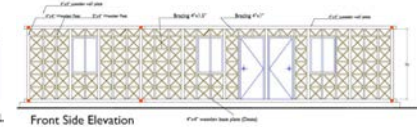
Typical front elevation of an engineered Dhajji building after the 2005 Pakistan earthquake.
